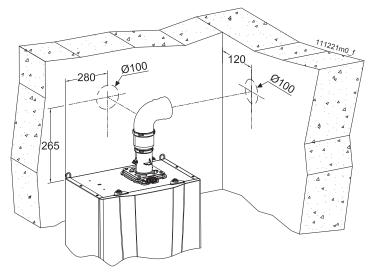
Measurements and centre space distances for single exhaust preinstallation hole
